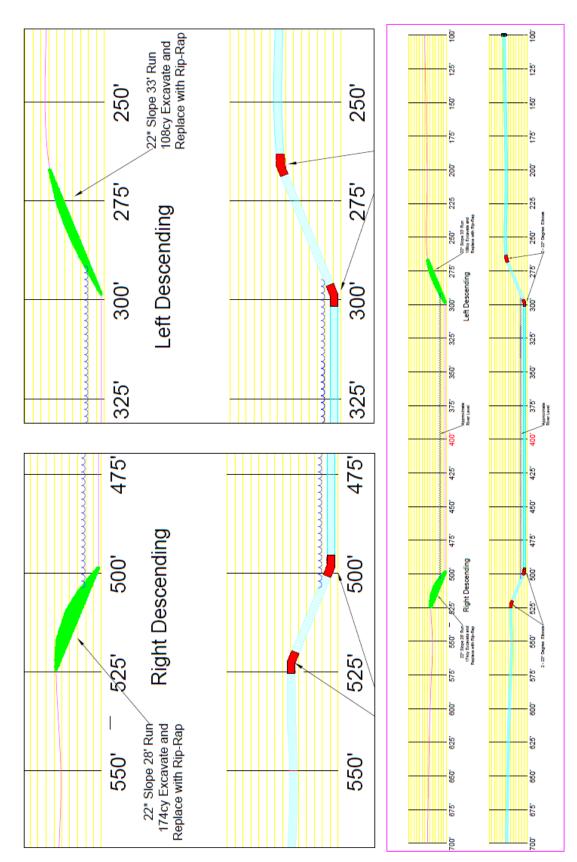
Slurry pipeline crossing Neosho River, cross section of existing elevations.
